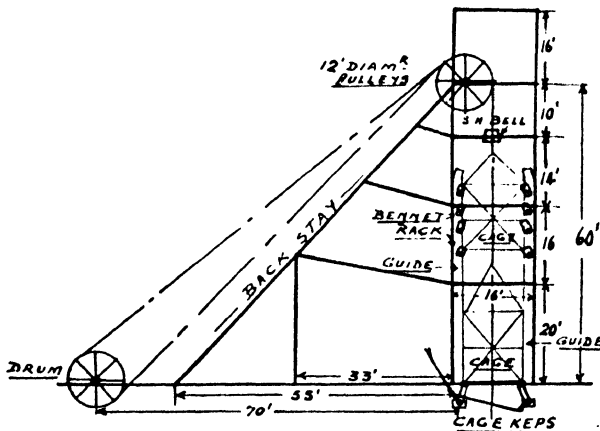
Side Elevation of Pit Headgear and Fittings.
